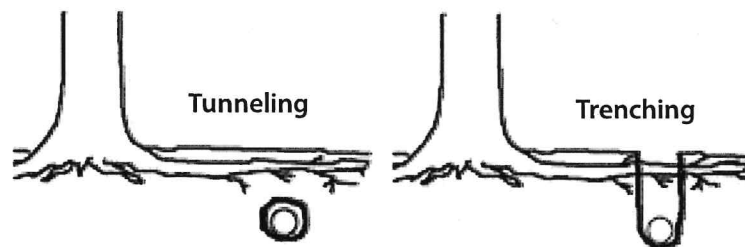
Utility lines may be placed near trees without root injury by tunneling underground. An alternative is trenching with a pneumatic air excavator or careful hand digging.
